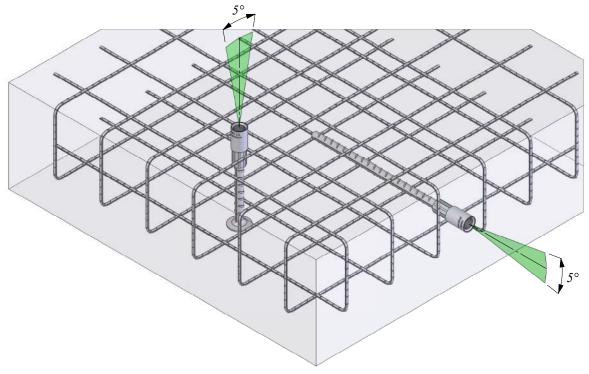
Angle tolerances for installation of Peikko Lifting Systems.
